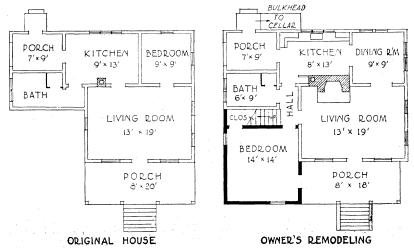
First-floor plan of house 11, before and after remodeling.
